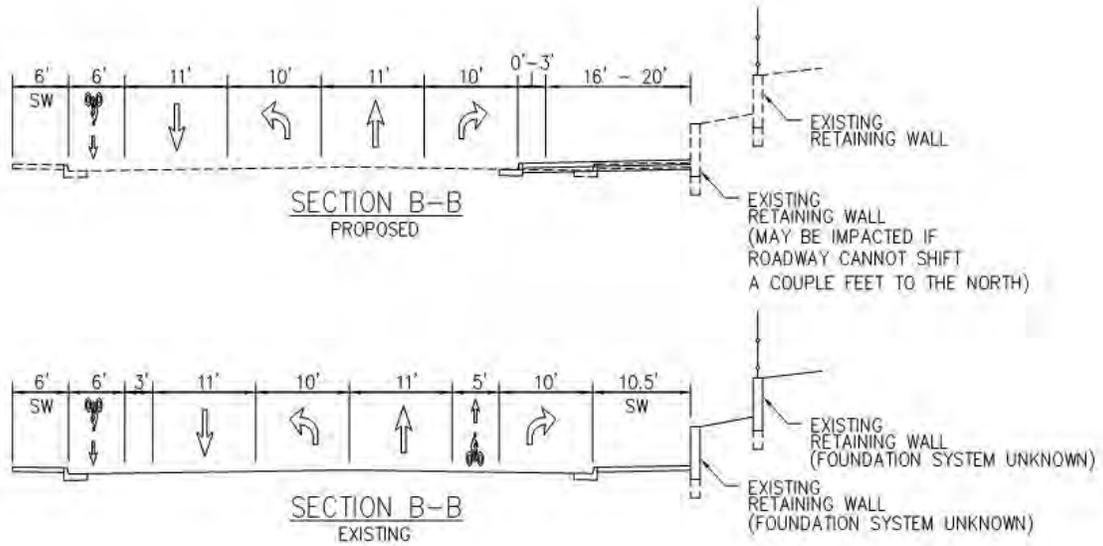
Cross-Section Constraints along Blossom Hill Road near Roberts Road East intersection
